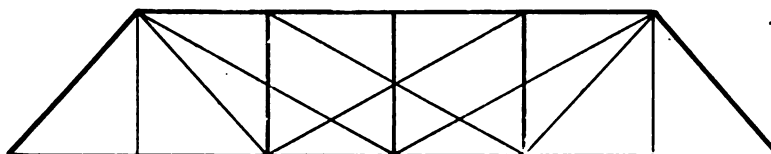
WHIPPLE TRUSS DIAGRAM.
